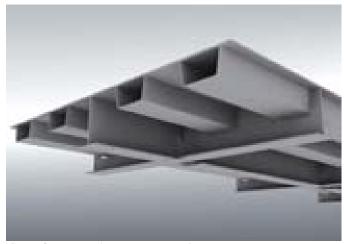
CANAM Steel Orthotropic Deck Panel [6]
